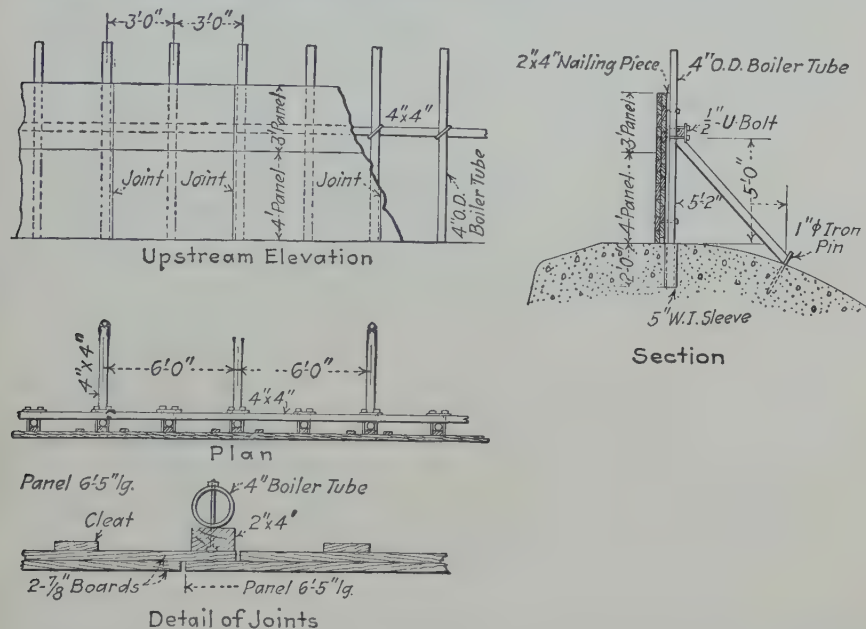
Flashboard details—Turners Falls dam, Turners Falls Power and Electric Company.
